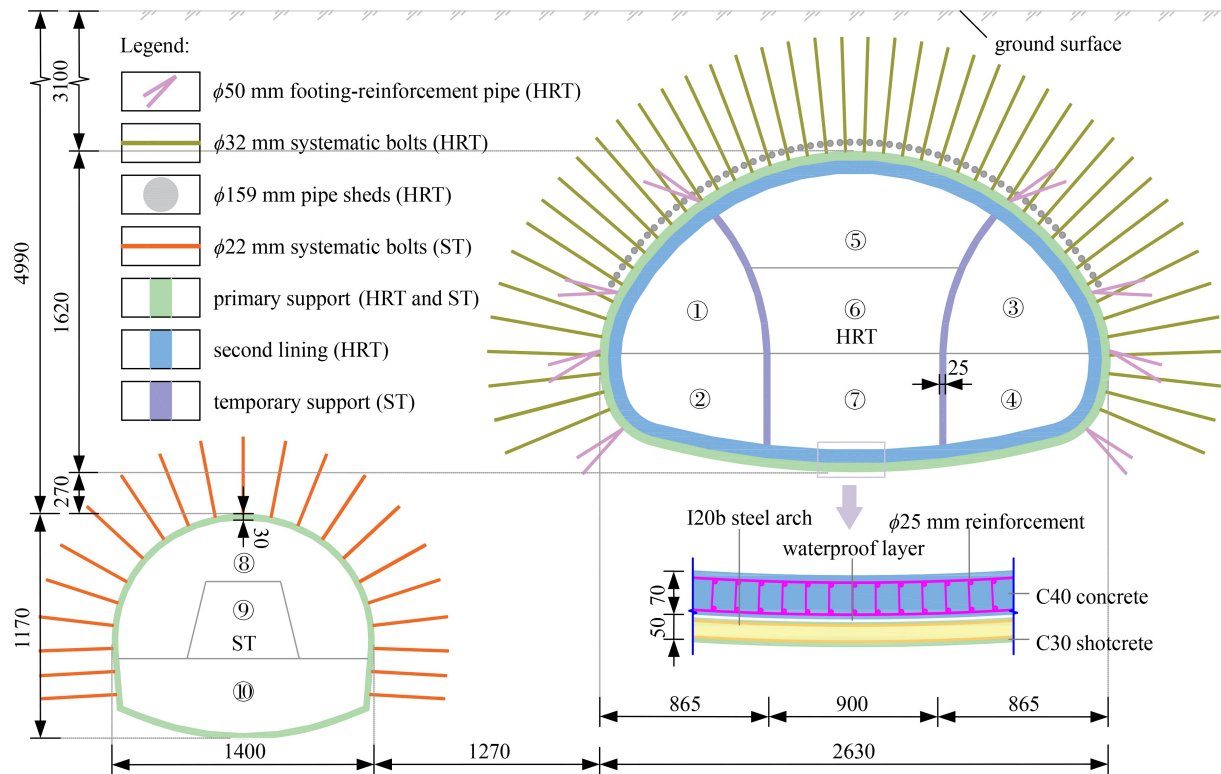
Tunnel cross-section and support system in DK215+113 (unit: cm).
